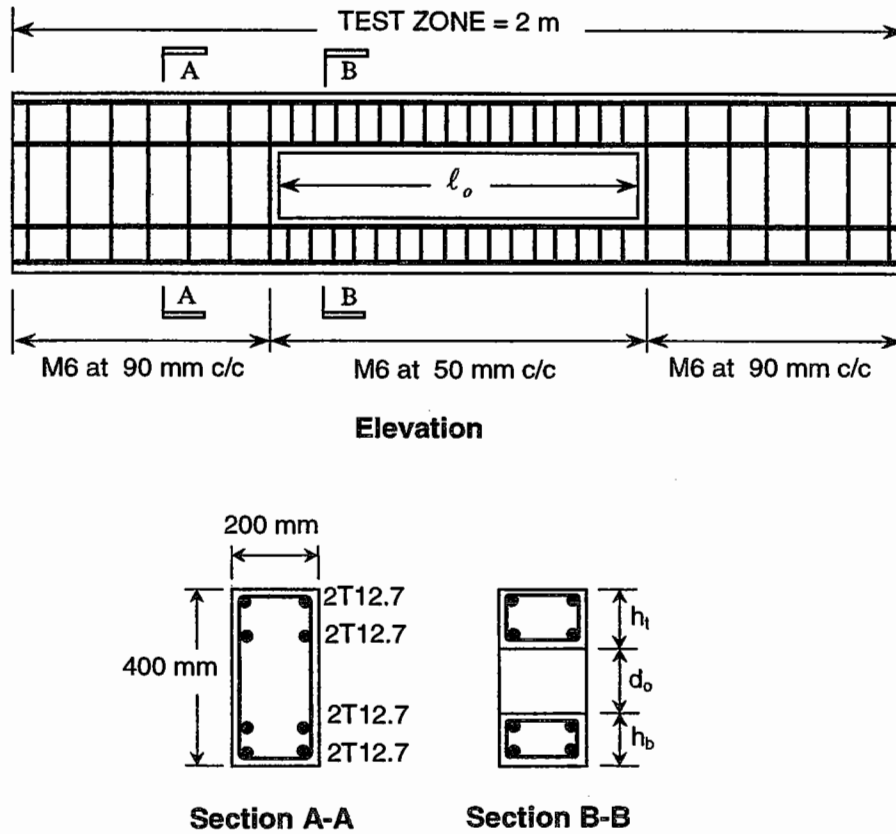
Details of beams tested by Mansur et al. (1983a).
